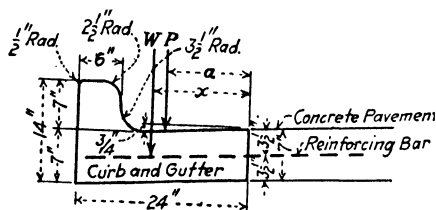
Curb-and-gutter tied to concrete pavement slab.
